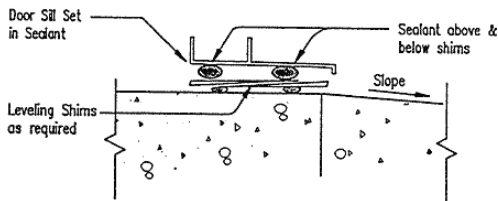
Concrete or Wood Sub-Floor with Shims
